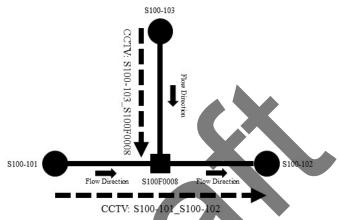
Performing Sewer Pipe Inspections
